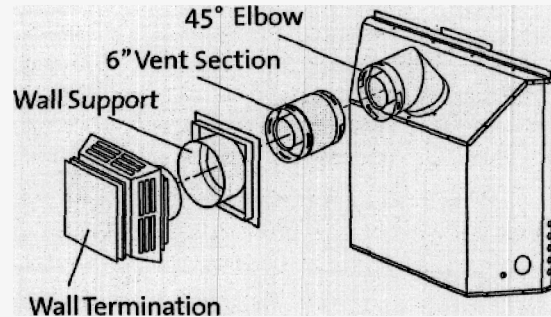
Typical minimum horizontal vent configuration - 5/8 Simpson DuraVent. Do not use 4/6 pipe in this configuration.
